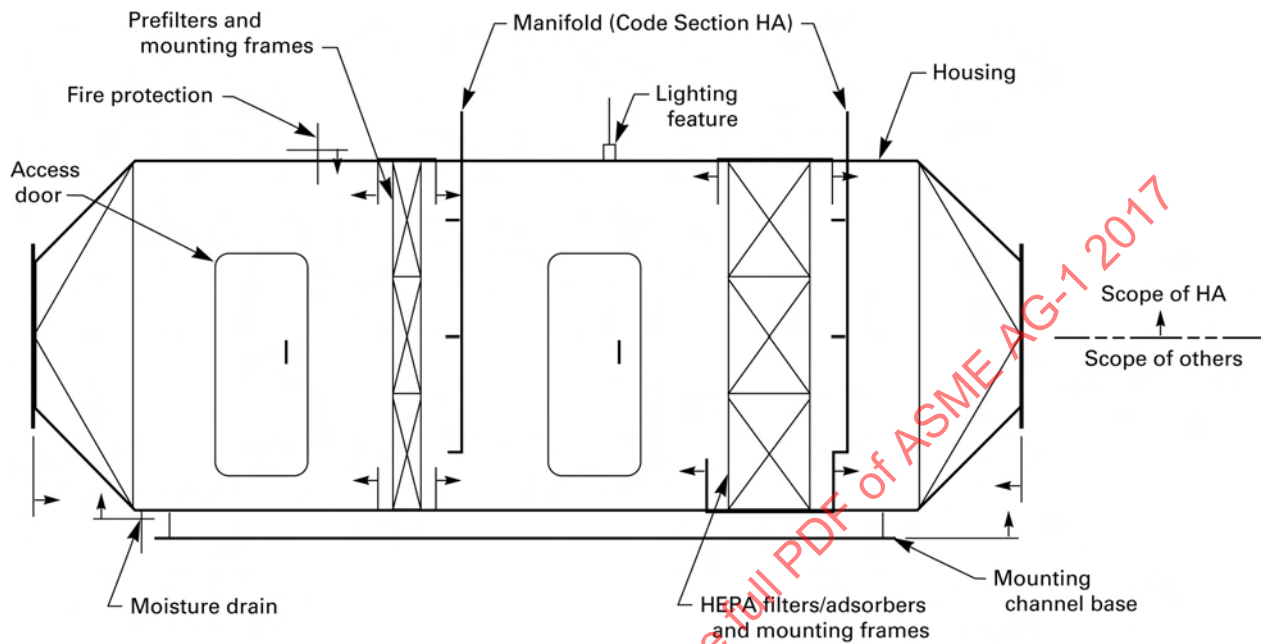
HOUSING, AIR CLEANING UNIT: SIDE-ACCESS TYPE
